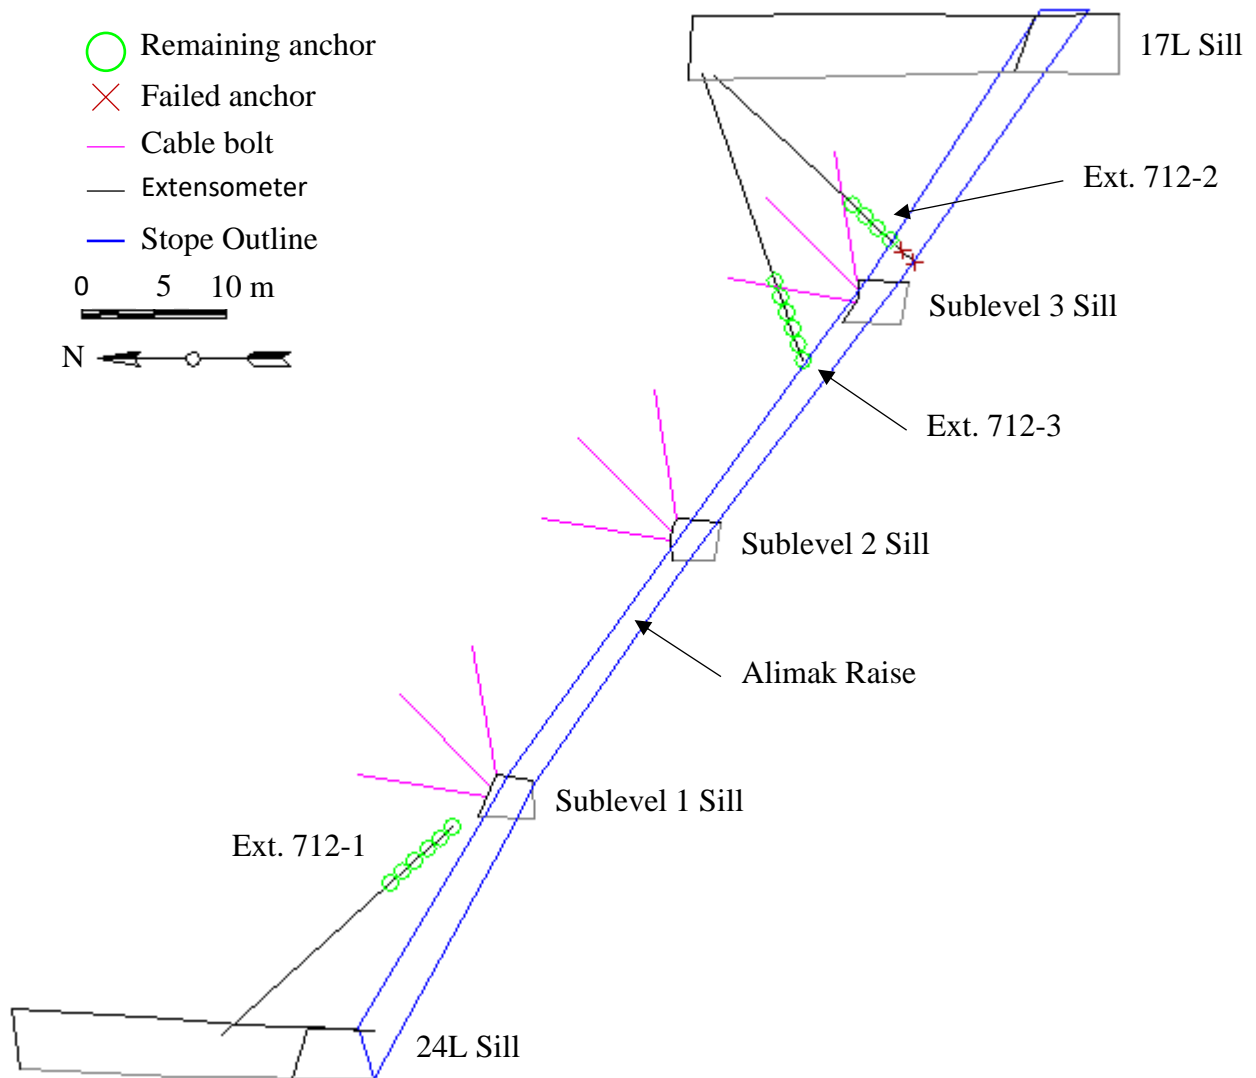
Cross section view adjacent to the Alimak raise of the Santoy 24L 411 stope looking east and showing the stope design outline, projected extensometer locations, and ground support,
